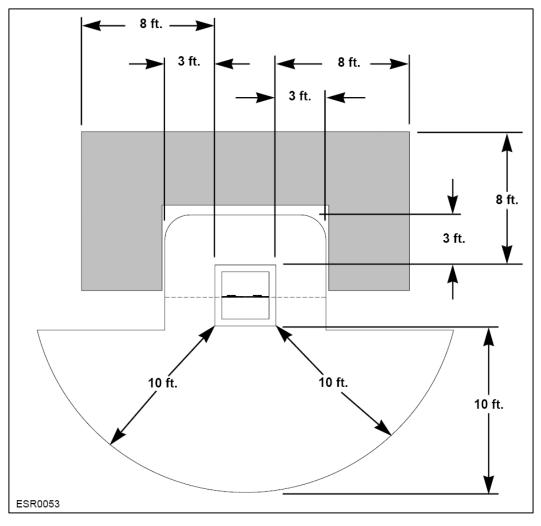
Working Clearances Around Pad-Mounted Electrical Equipment Adjacent to a Combustible Structure
